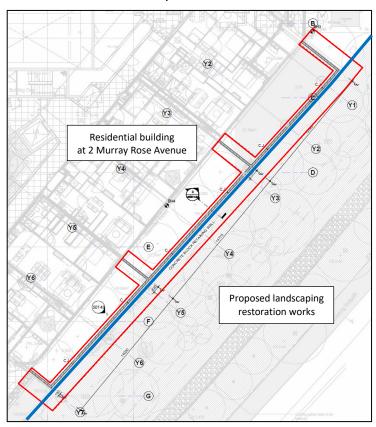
Plan showing the extent of the foundations of the proposed retaining wall in red and site boundary in blue (Source: S01.11, Retaining Wall Plan, prepared by Smart Structures Australia, dated 29 April 2025)
